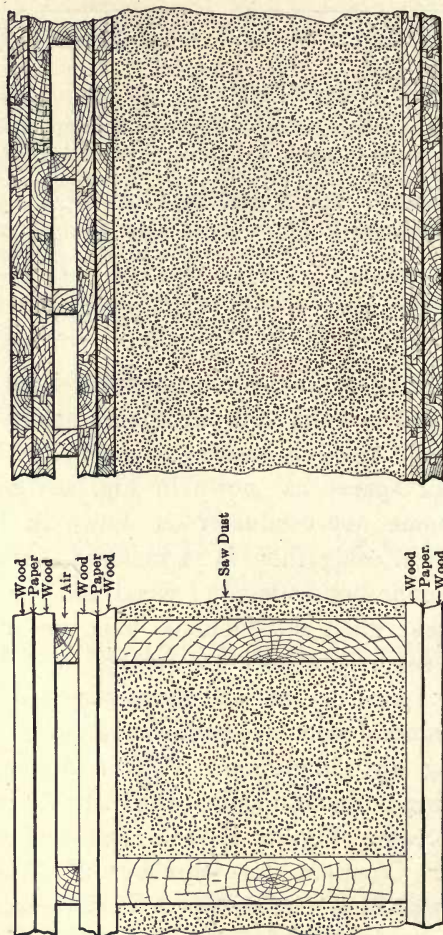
Wooden Wall with Sawdust Fill. (Elevation above, plan below.)
